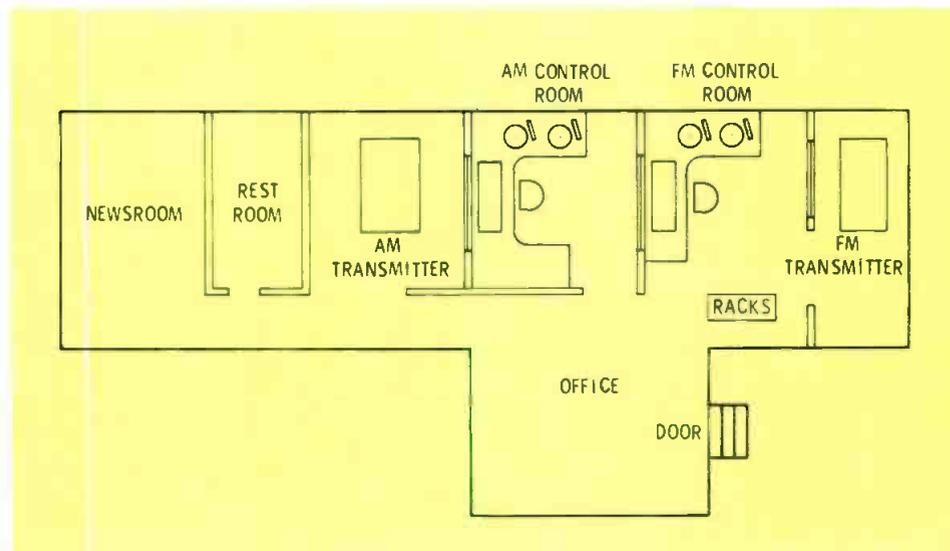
The KFIL floor plan. This is an AM-FM station.
